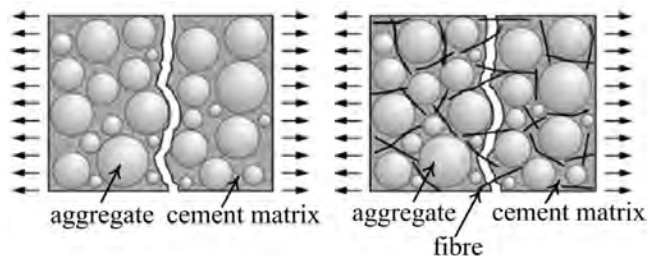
Crack in conventional and fibre reinforced concrete (Fib, 2009)
